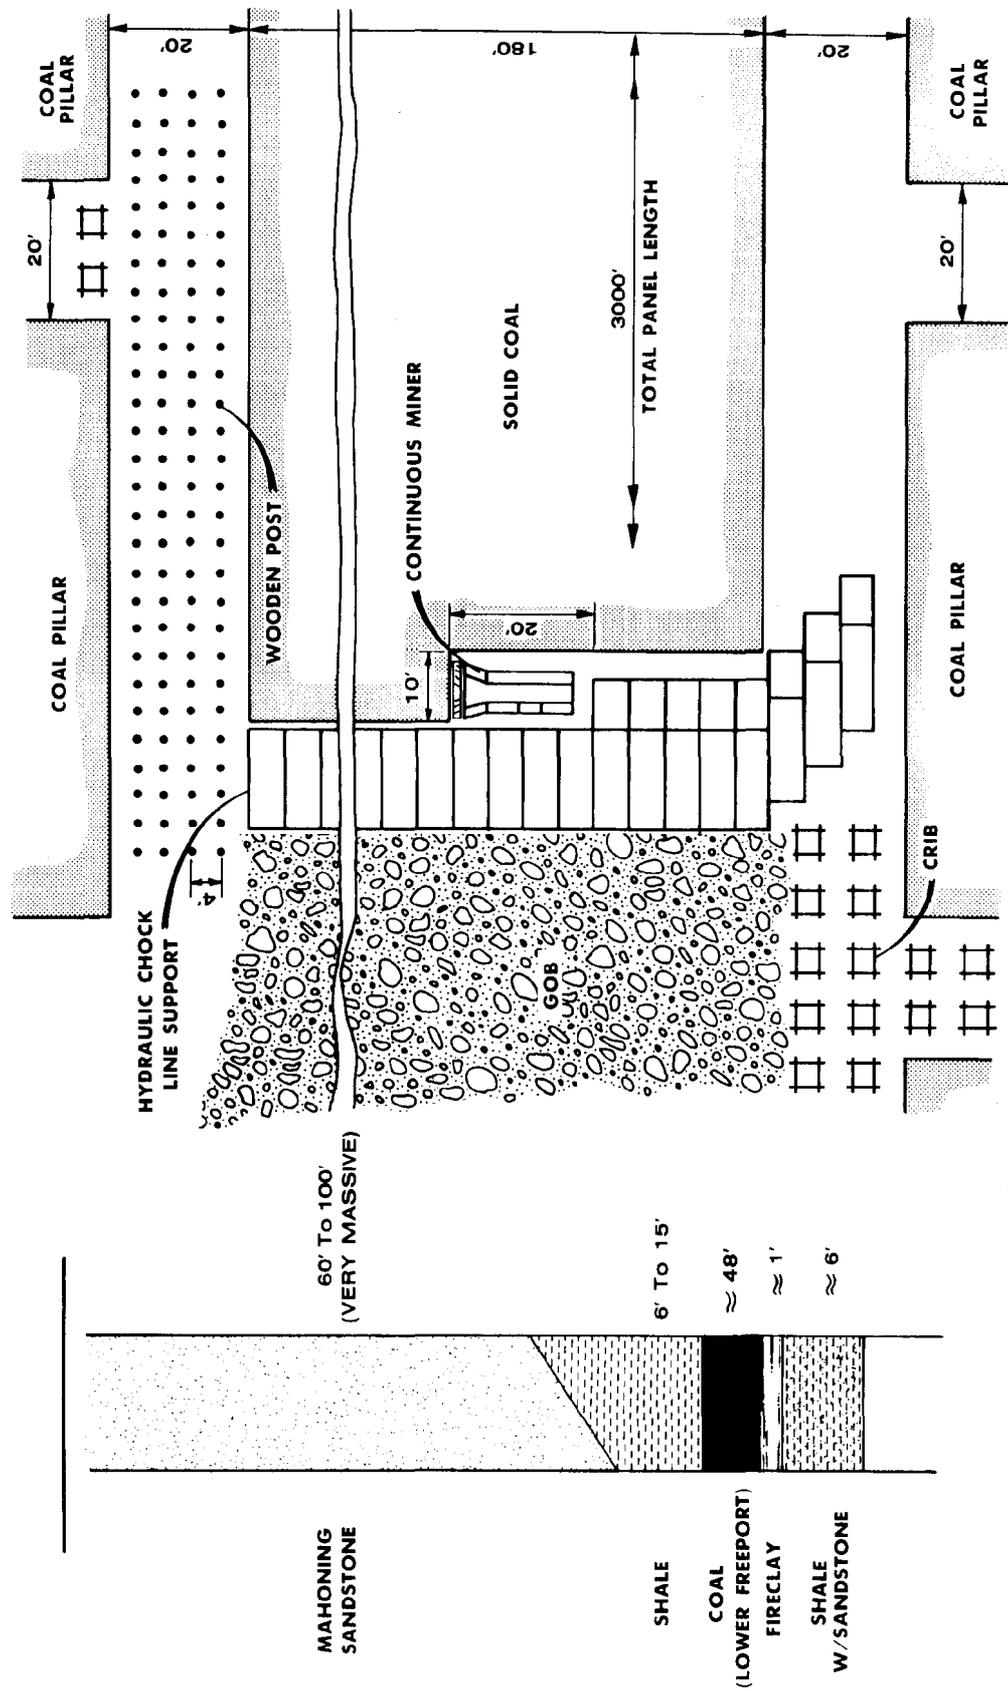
Mine PaA - Geologic section and plan layout of shortwall.
